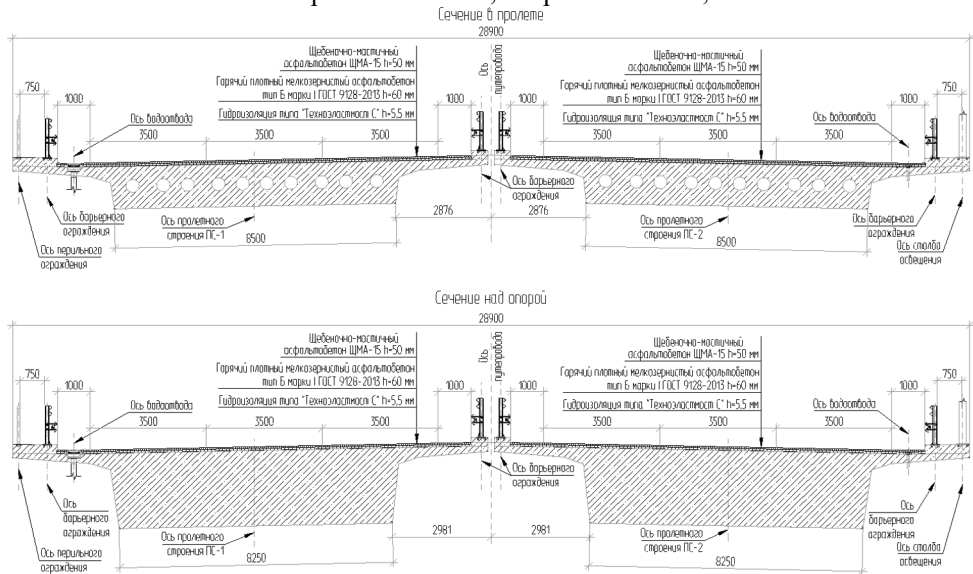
Cross-section of the span structure of a continuous (monolithic) reinforced concrete overpass built in the city of Samarkand
